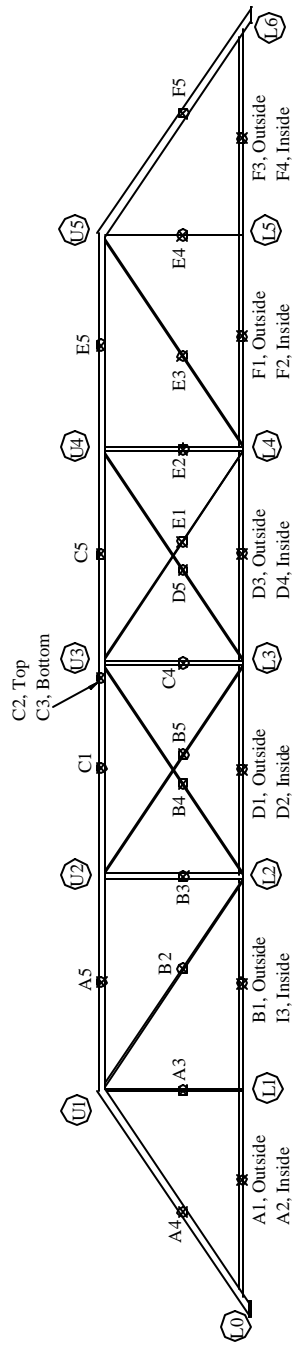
Field load test No.1 – Gage identification for upstream truss
